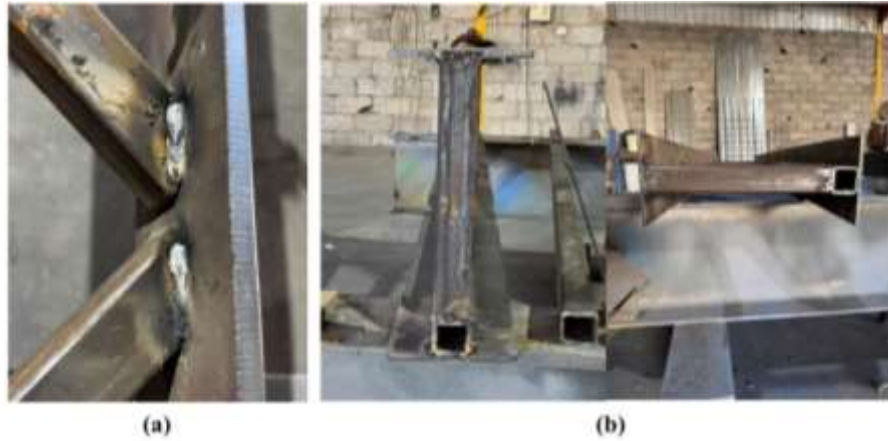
Manufacturing of Category (SCTG). (a) HSS Diagonals Members Welding, (b) Cross-Section of the Truss Girder
